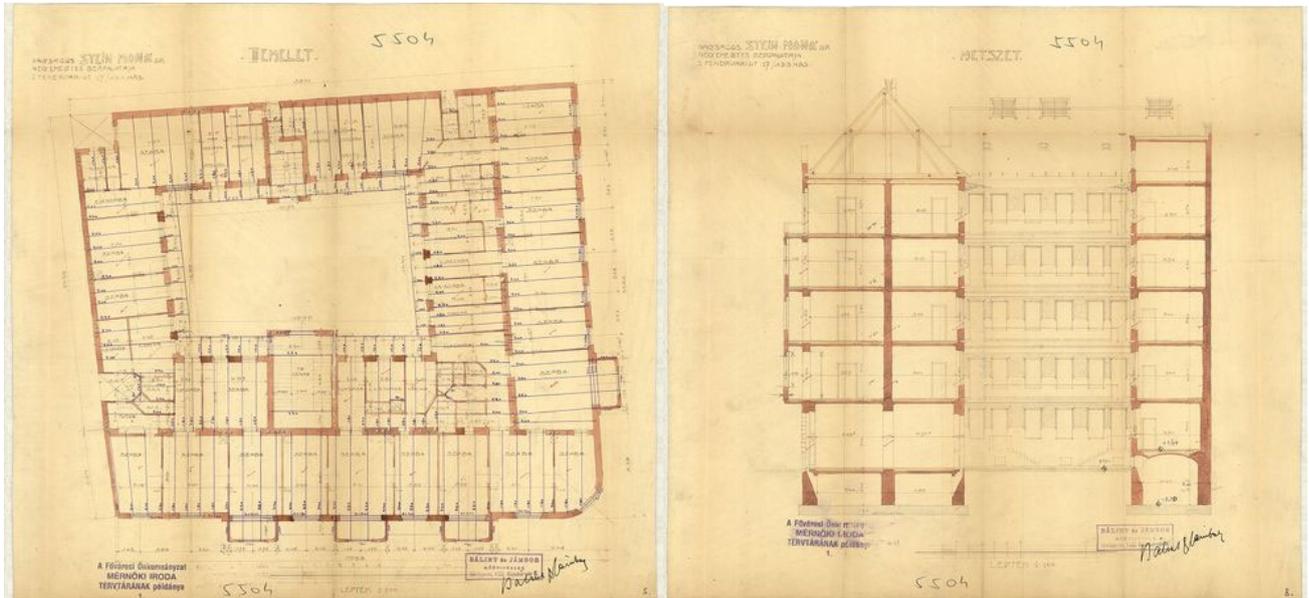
a) Samples of the typical plan and b) vertical plan (old drawings)
